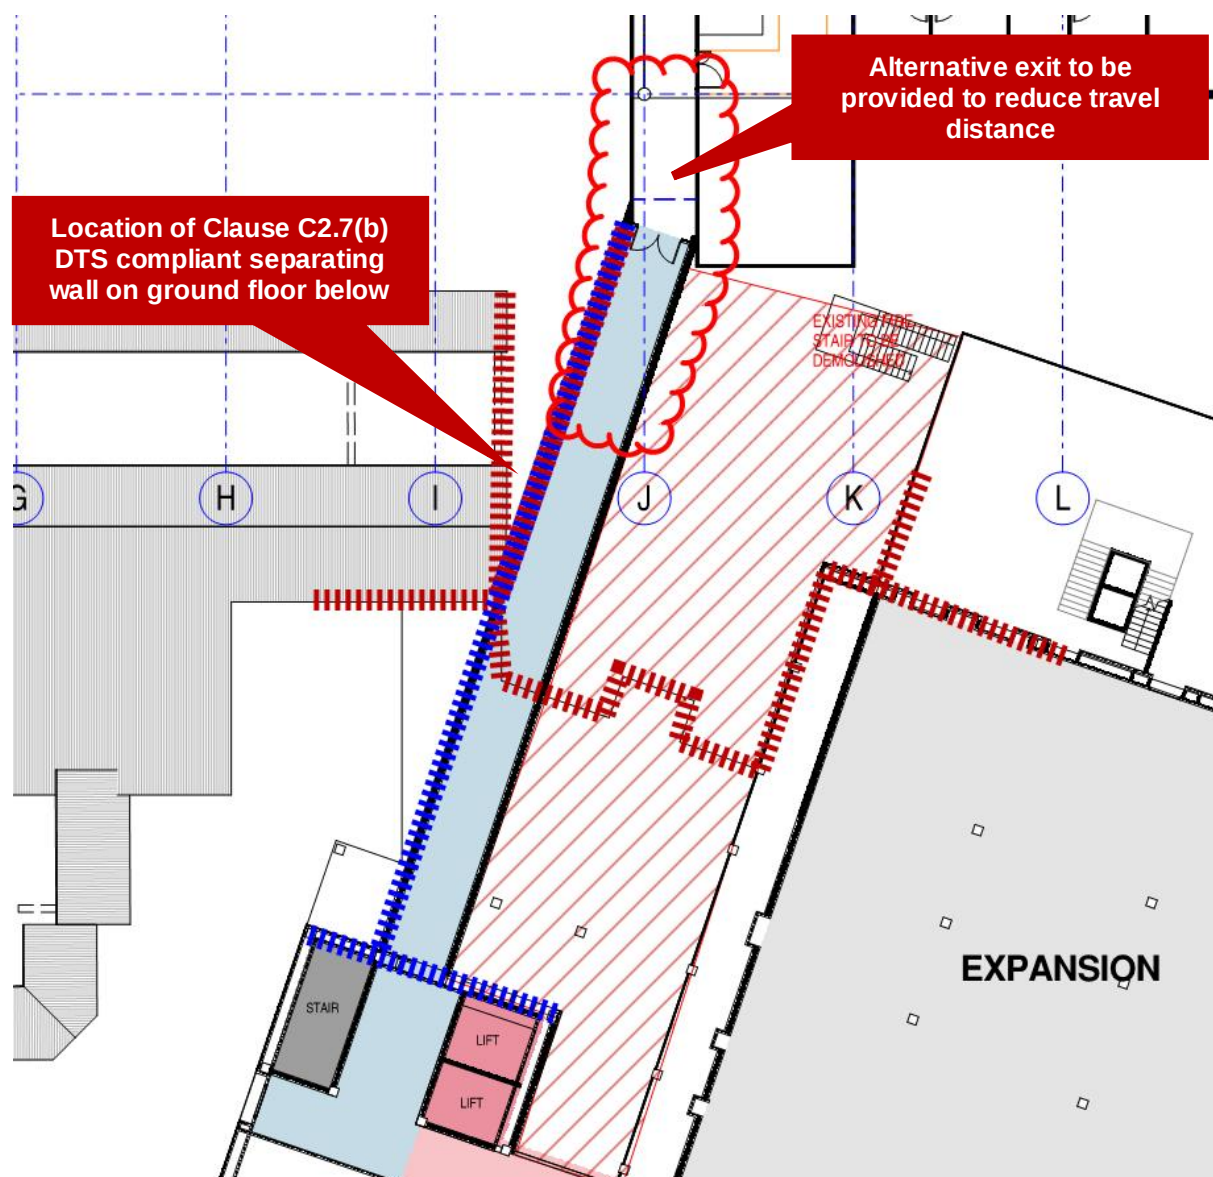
Level 1 connection between Acute Services Building and Brudelin Building
